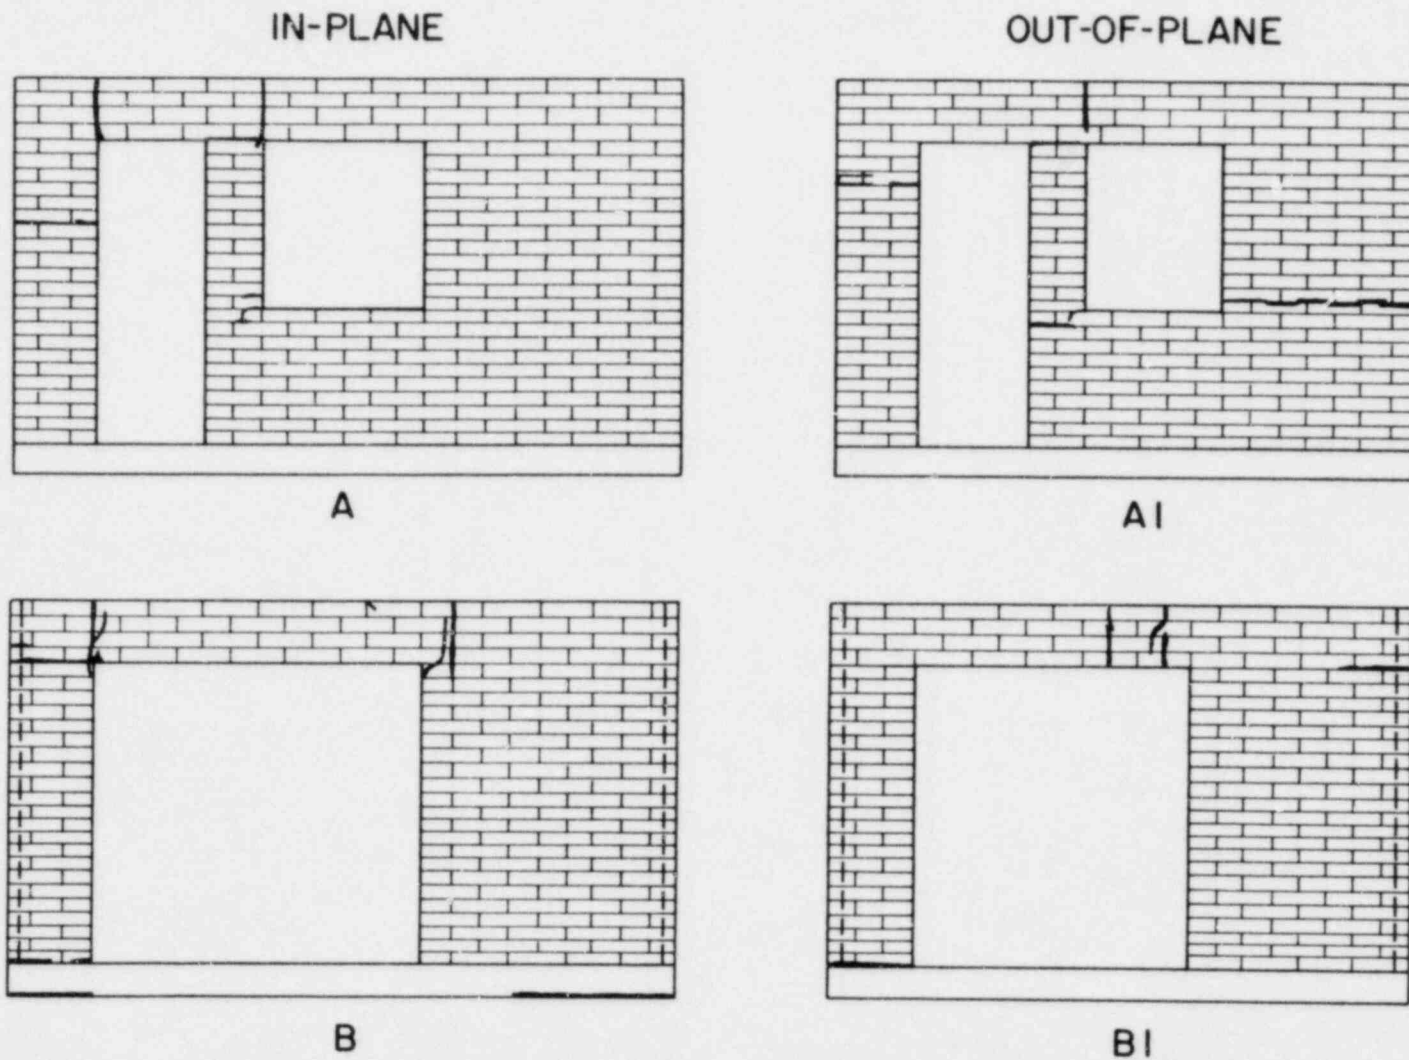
(h) DISTRIBUTION OF CRACKS IN THE MASONRY COMPONENTS: HOUSE 2, AFTER TEST 30 (EL CENTRO - 0.37 g)
